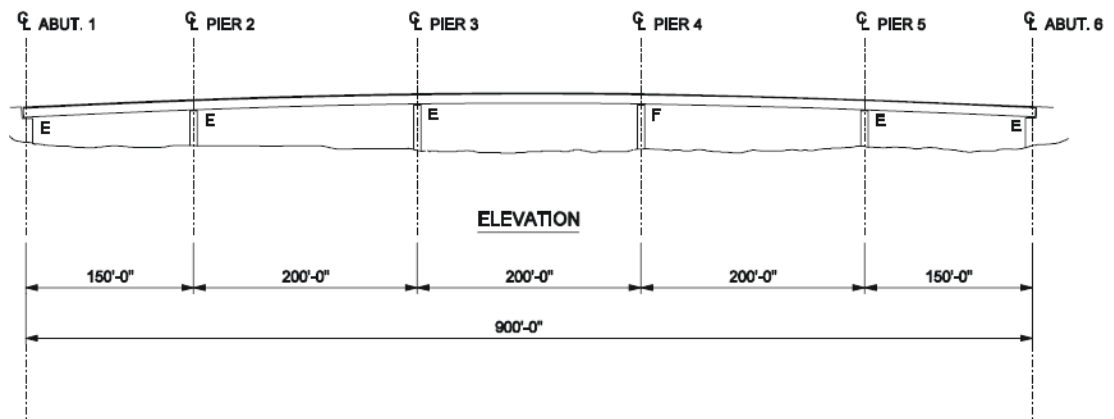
Elevation view and boundary conditions of precast balanced cantilever bridge (Theryo, 2005)
